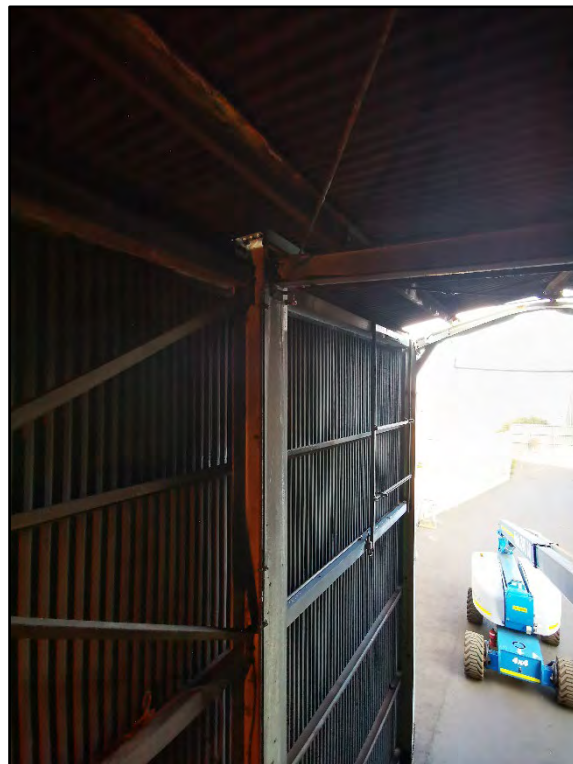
Surface Corrosion of Purlins, Columns and Rafters
